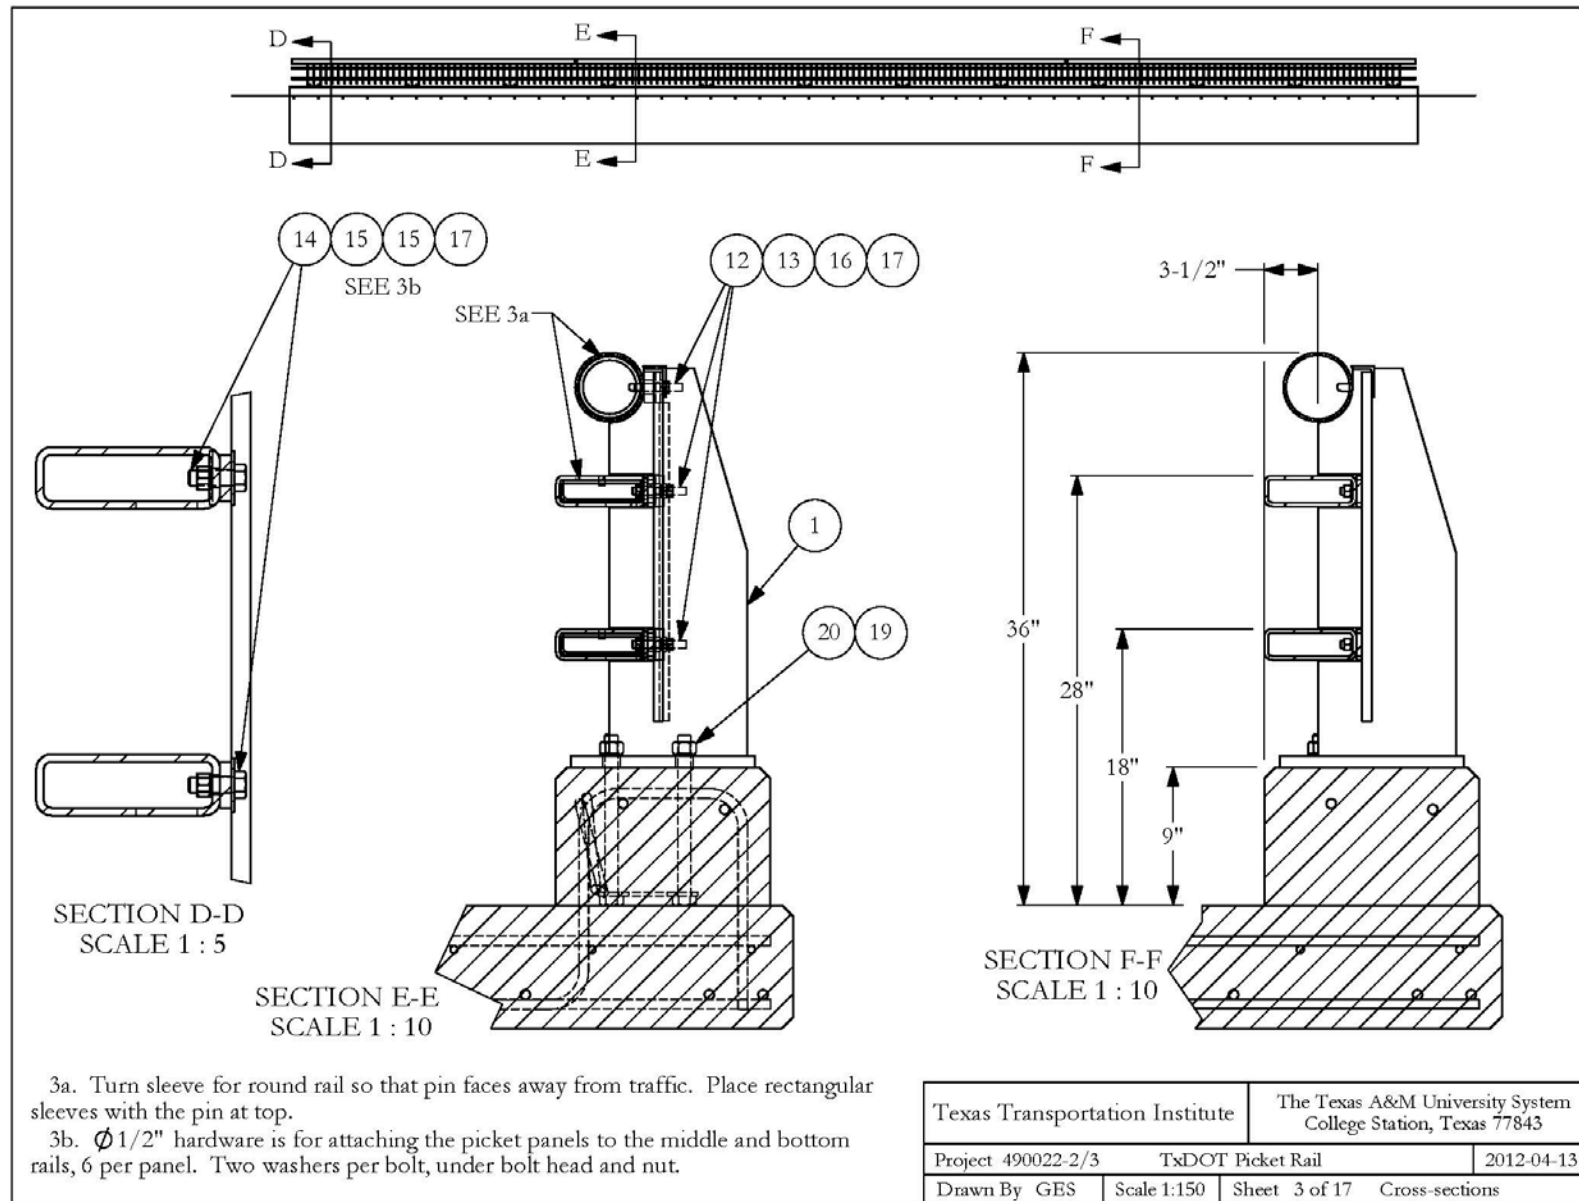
Details of the TxDOT Picket Rail Installation.
